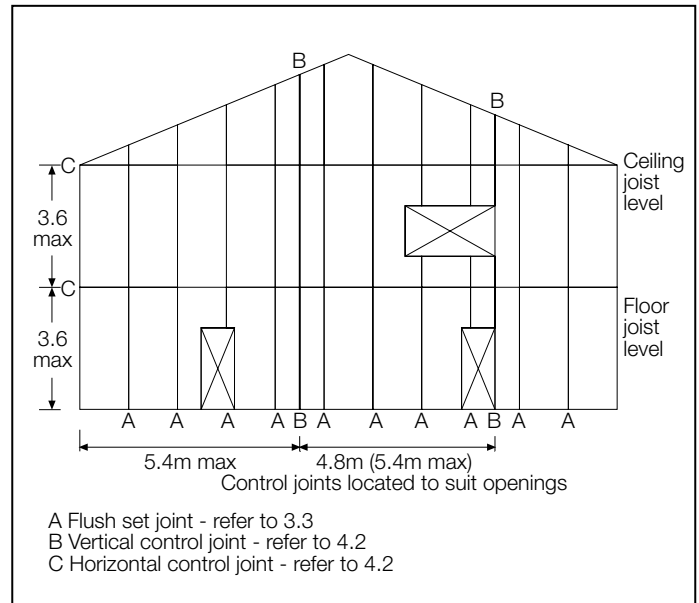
AN EXAMPLE OF CONTROL JOINT LAYOUT
